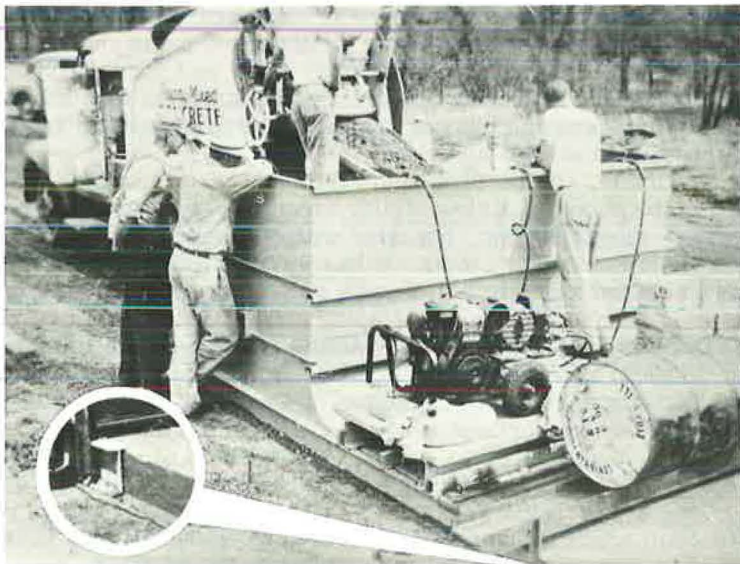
First practical slip-form paver laying an experimental concrete pavement; Iowa, 1949.
